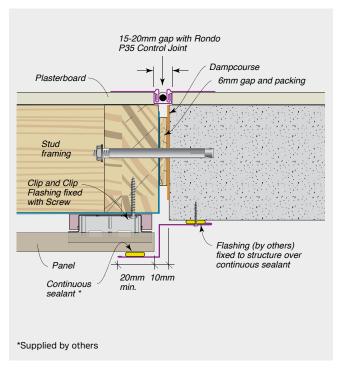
Typical Junction with Offset Masonry Wall - Plan View
